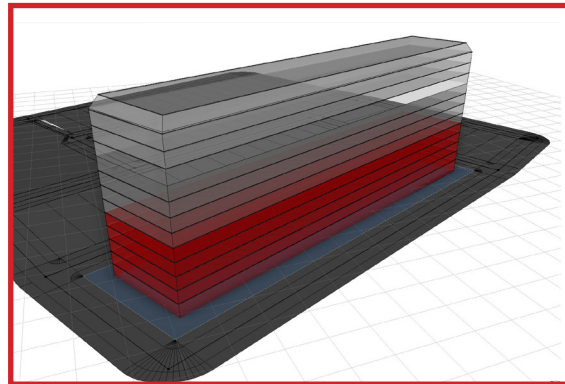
The building envelope depicts 5 floors of commercial use and 4 floors of office use.
